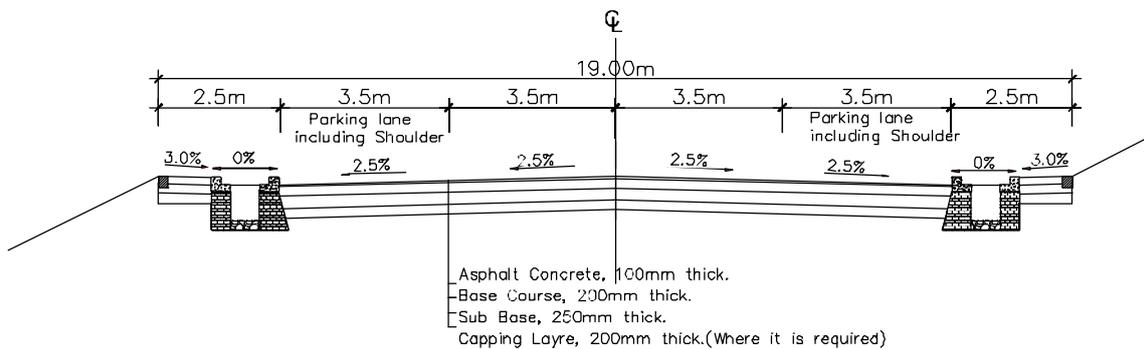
Proposed Typical Cross Section (Wereda Town and Populated Area in D/Markos)
